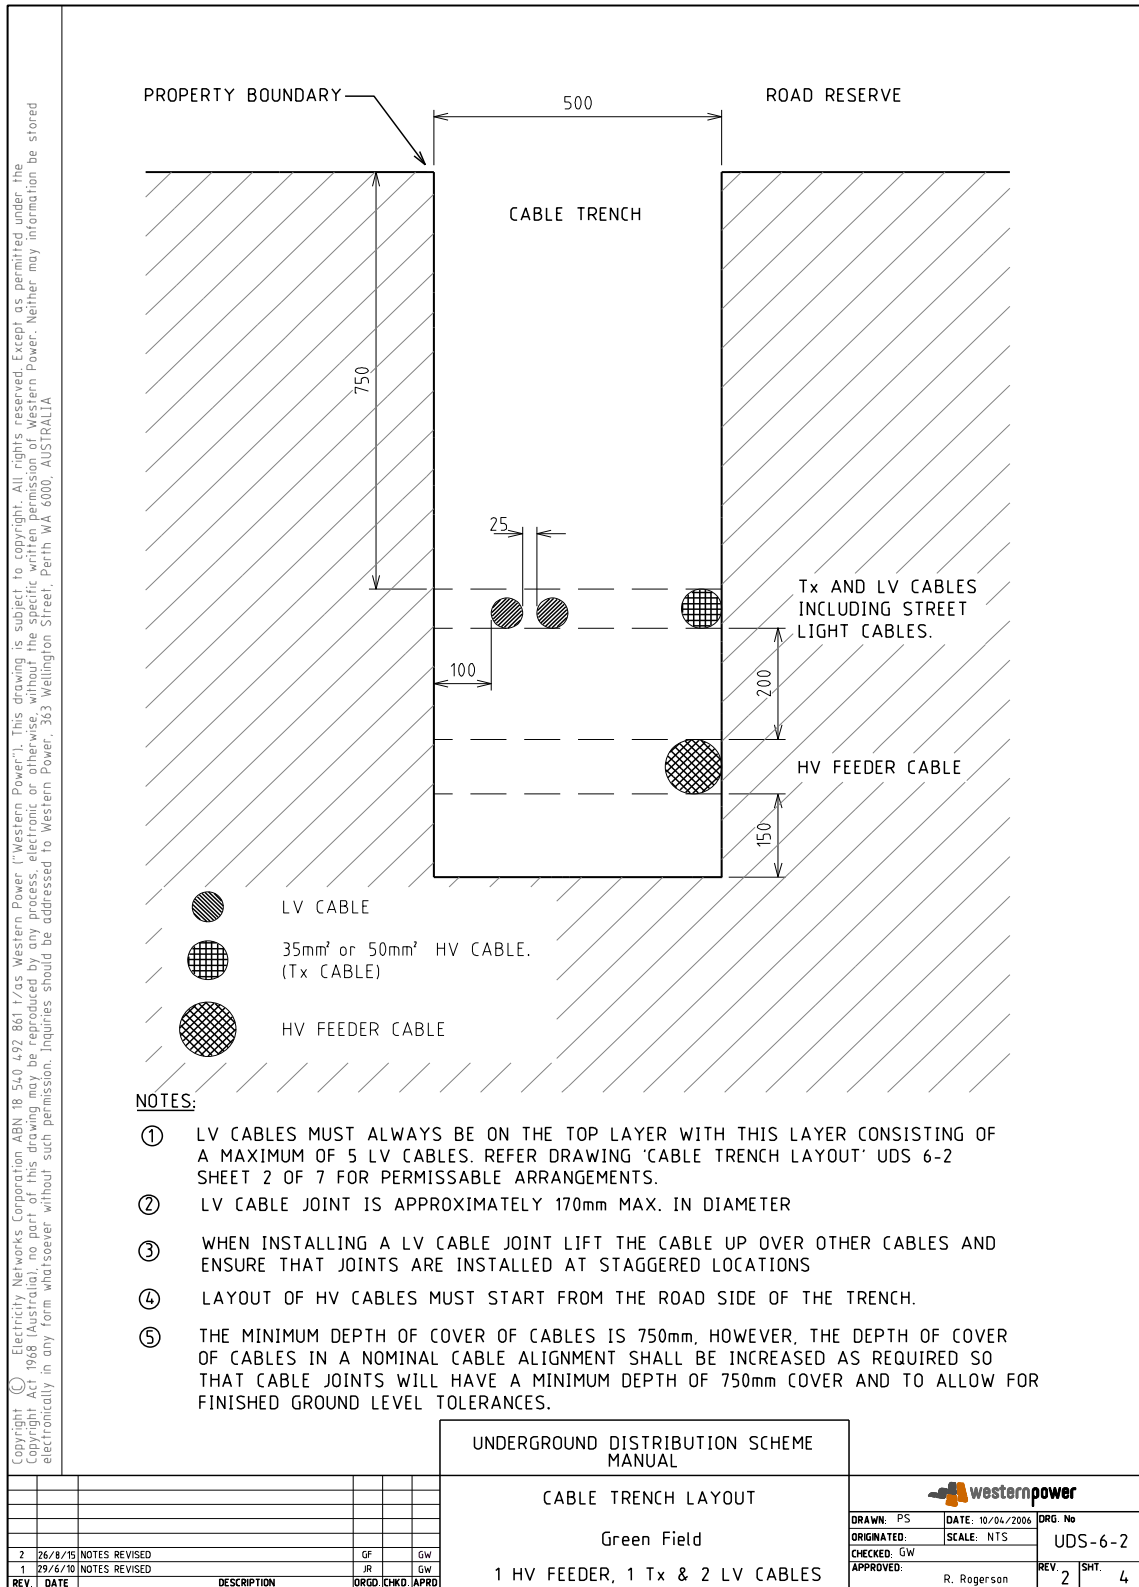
Cable Trench Layout (Sheet 4 of 7)
